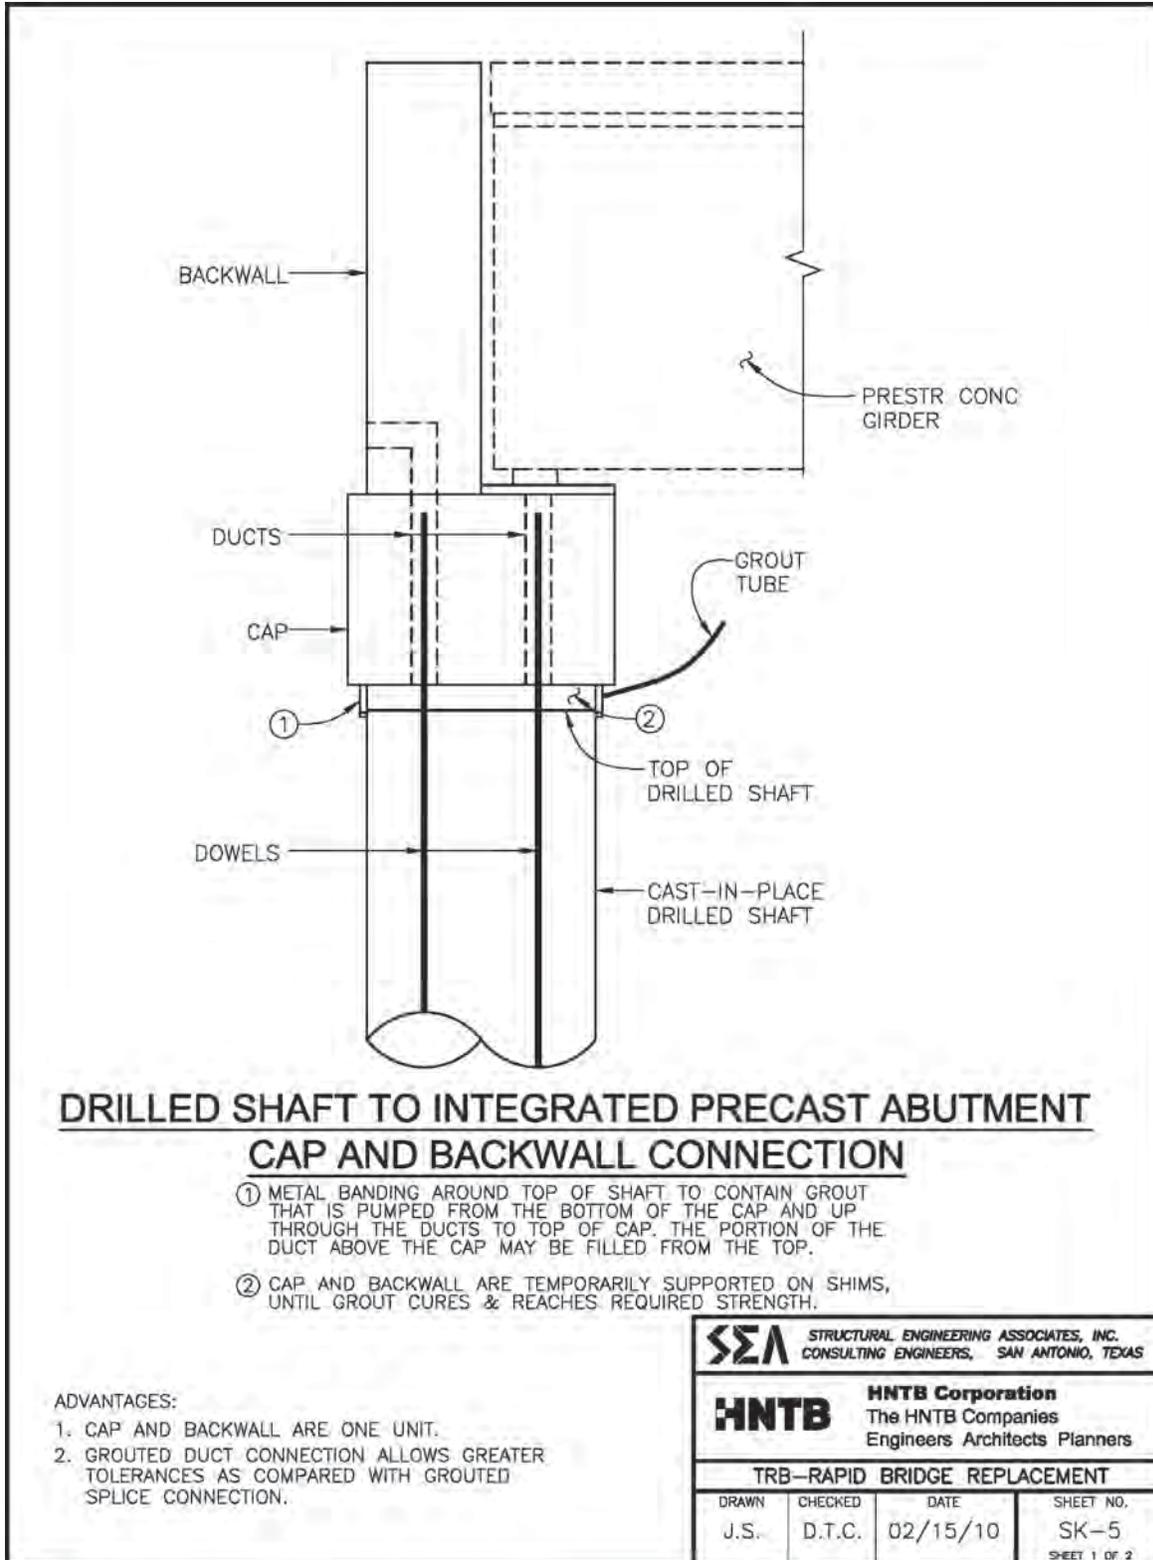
Alternate drilled shaft to integrated precast abutment cap and backwall connection—Option 1.
